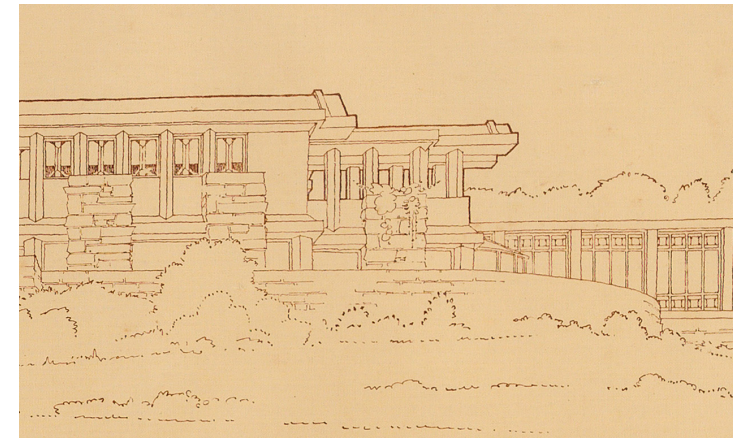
Detail showing the curved retaining wall and the upper-level open porch.
